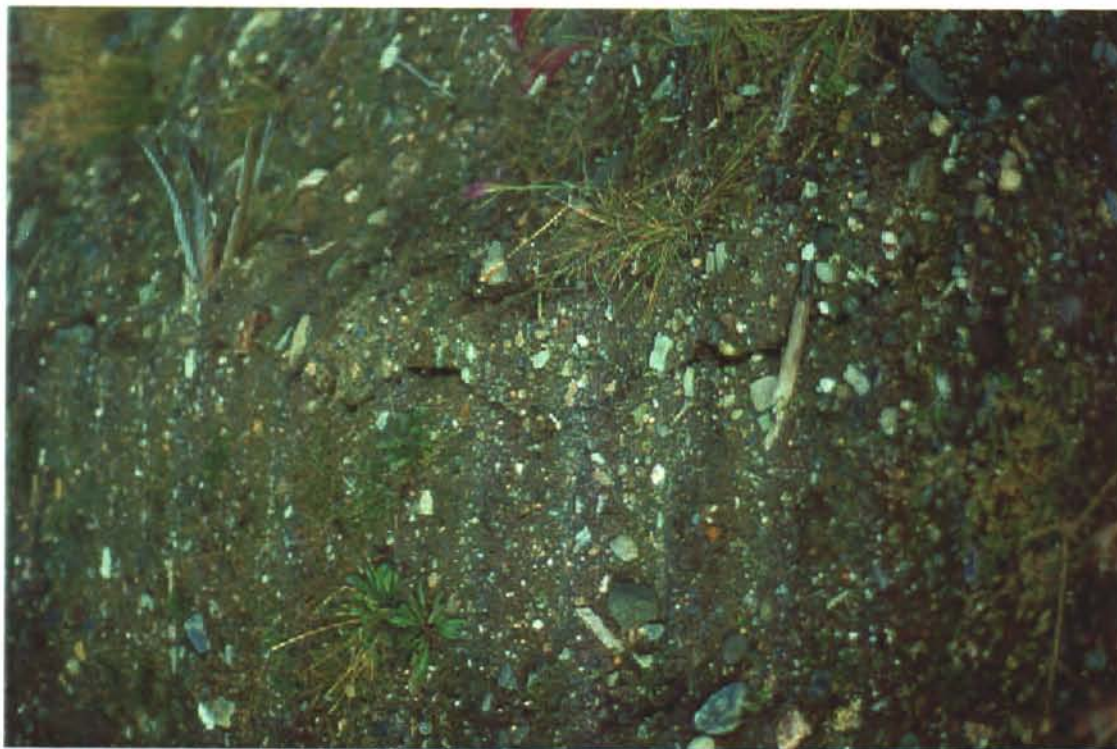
Tension cracks in the settling pond retaining wall. (Azimuth 000°)
